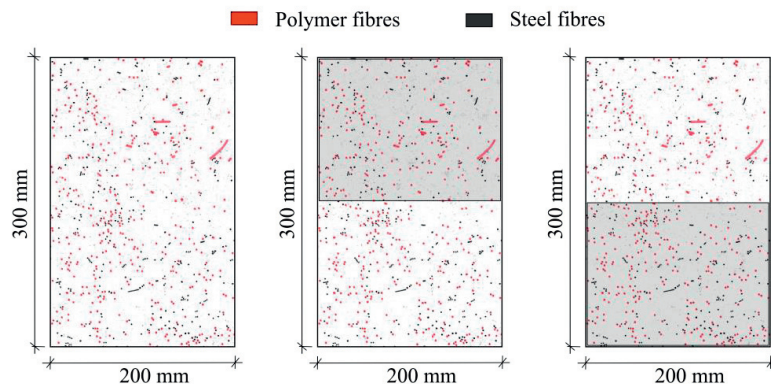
Hand-dotting of fibres over the cross-section of a full-scale beam, and counting across the top and bottom halves.
